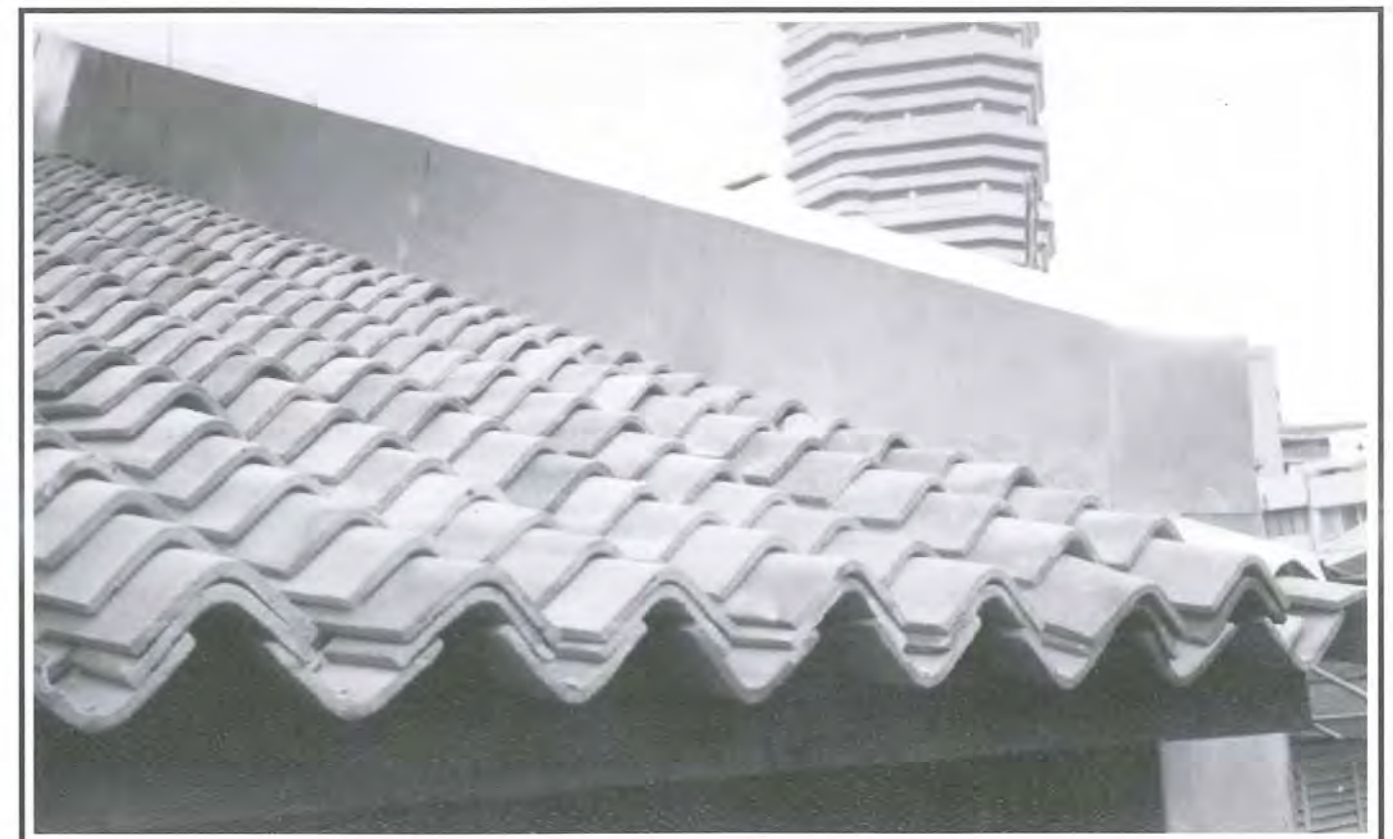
The use of glass reinforced concrete (GRC) coping at the partywall above the roof.
